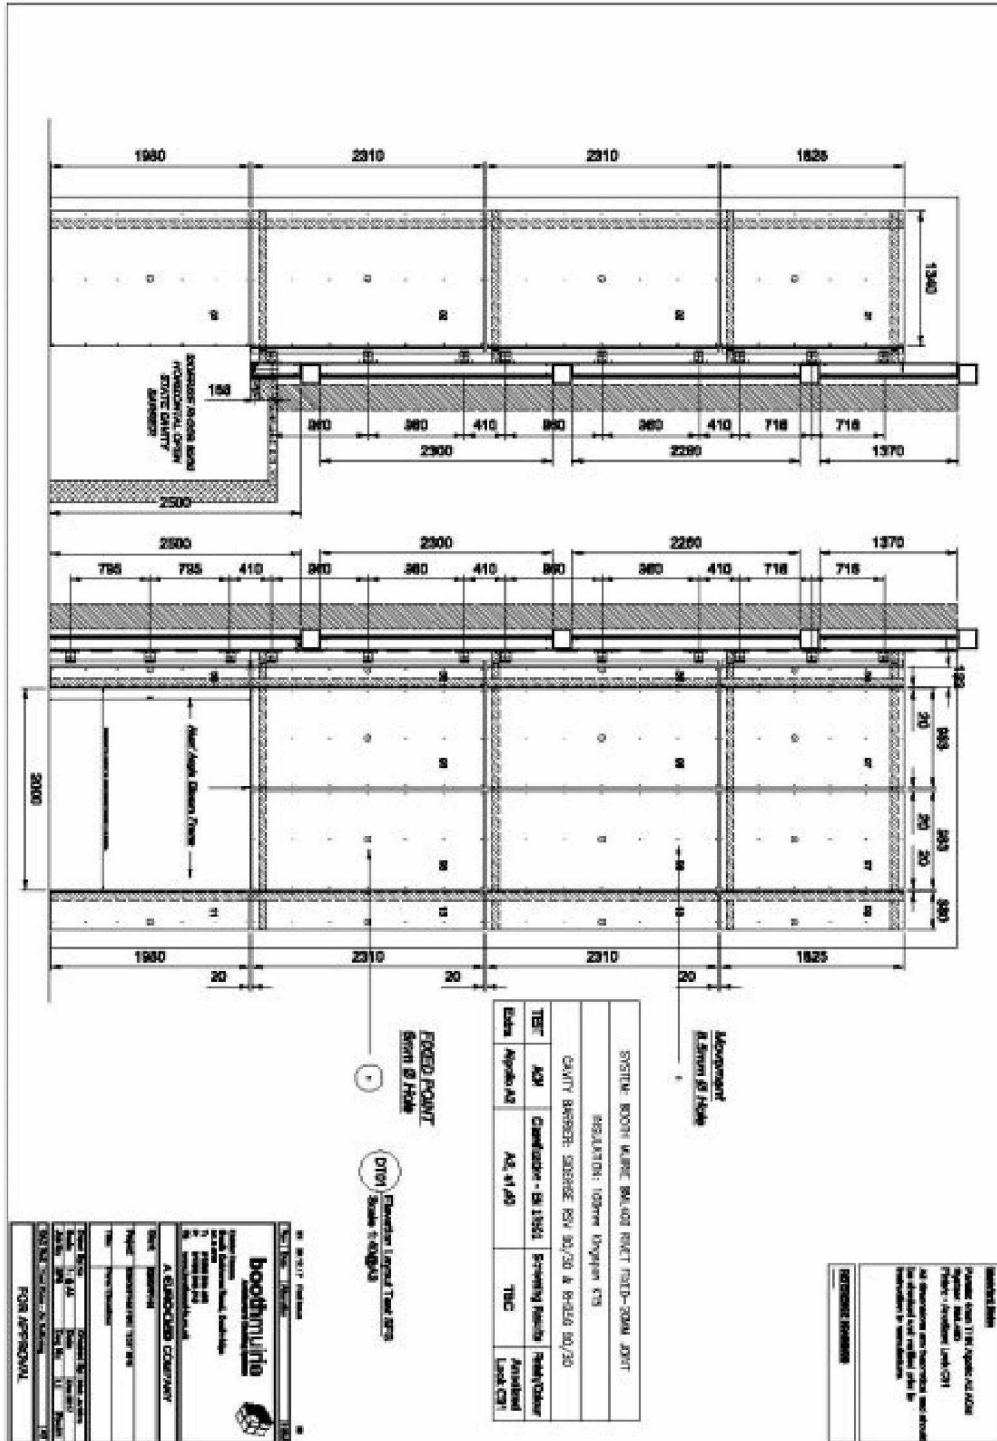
ACM panel dimensions (supplied by Test Sponsor).
